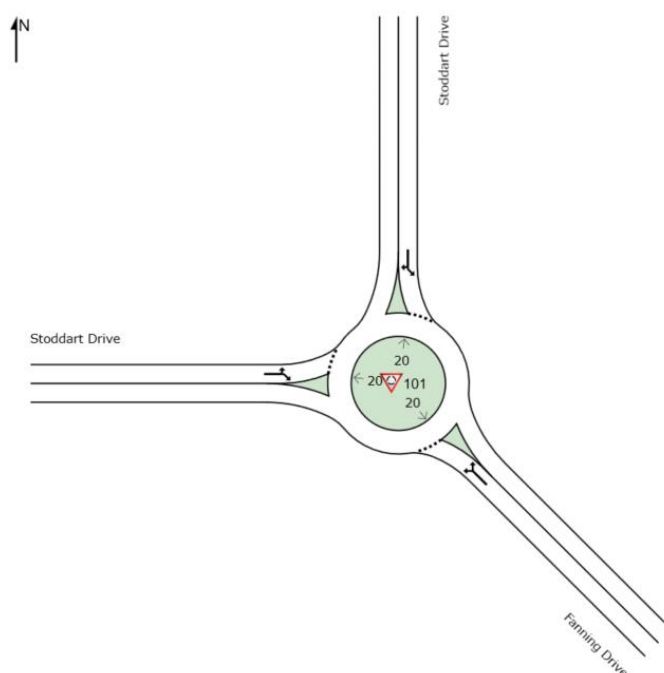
Intersection 3 Modelled SIDRA Layout
